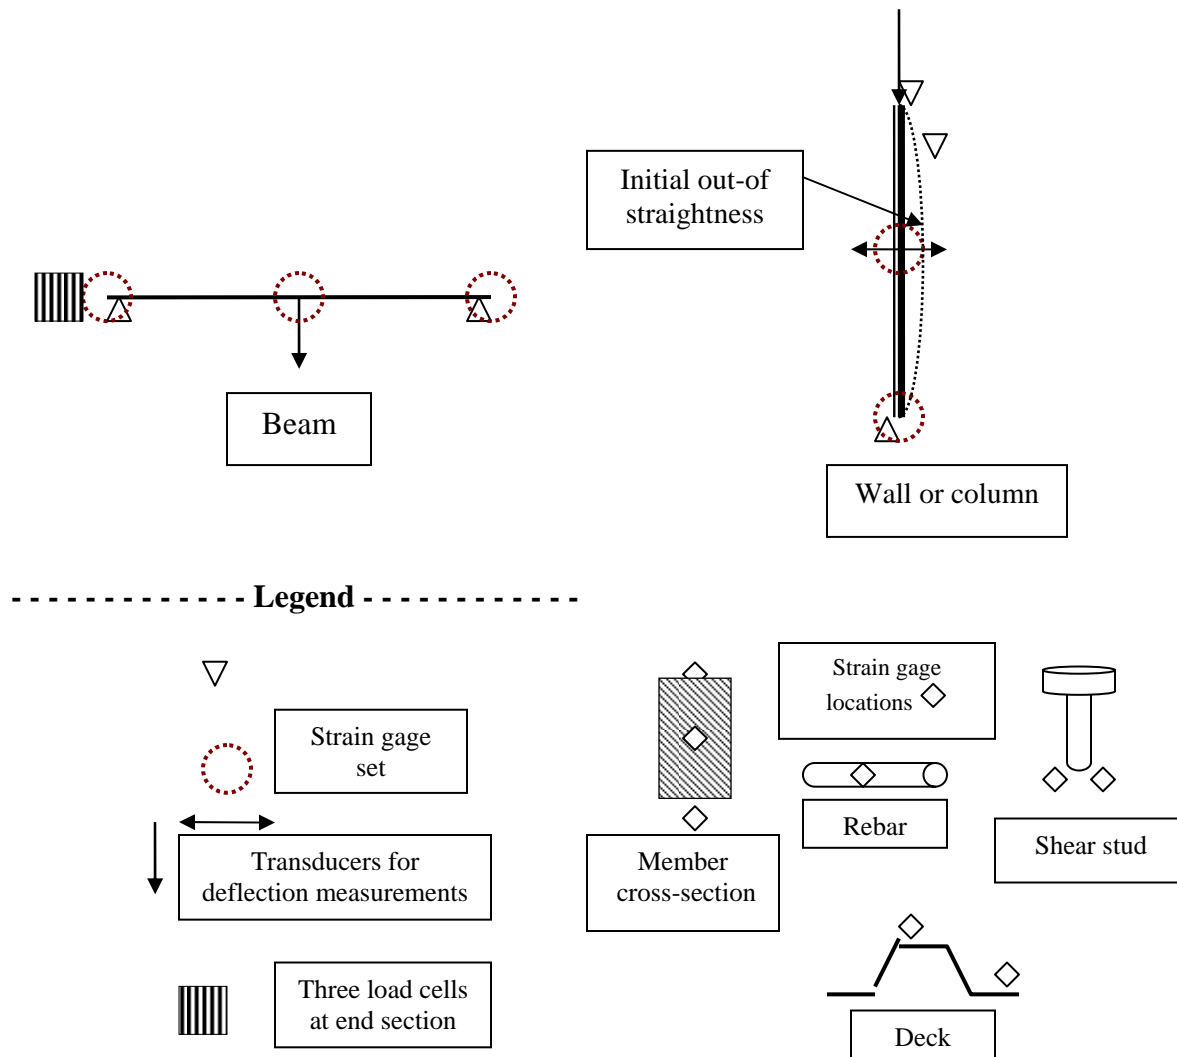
Illustration of recommended additional instrumentation for structural fire performance.
